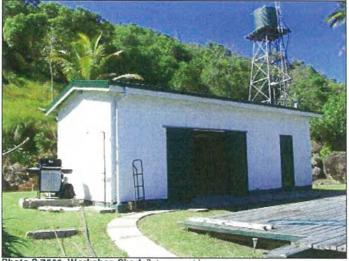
Workshop Shed, flat cover strips Photo S-7510: corner cover strips Photo S-7511: wall cladding
